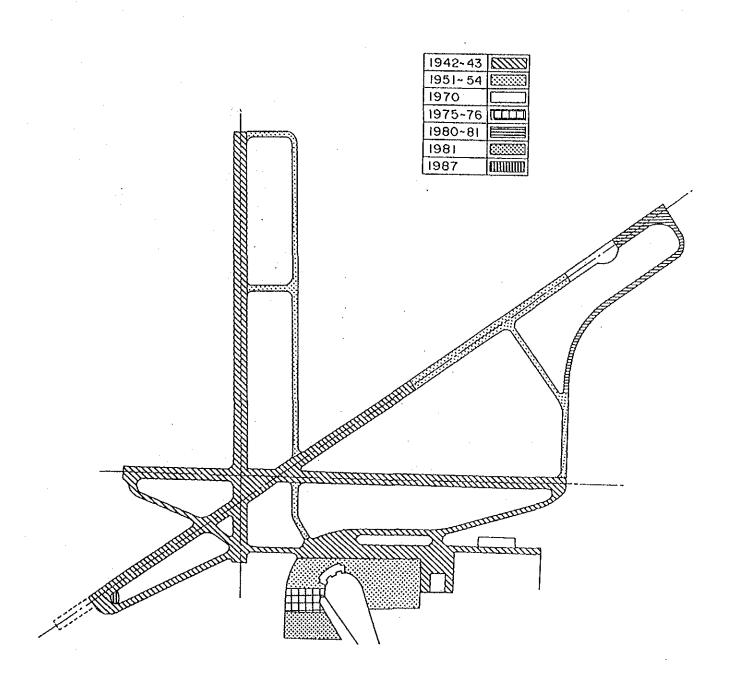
ORIGINAL CONSTRUCTION HISTORY
